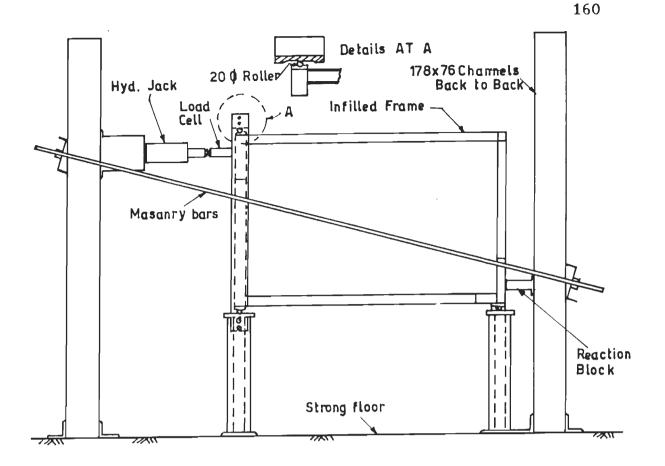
Test Arrangement of Masonry Infilled Frame
